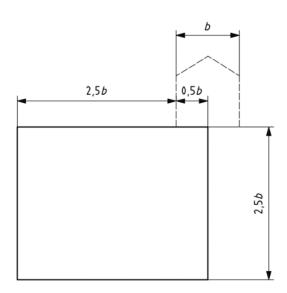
Ground geometry and dimensions for 2-D thermal bridge model
